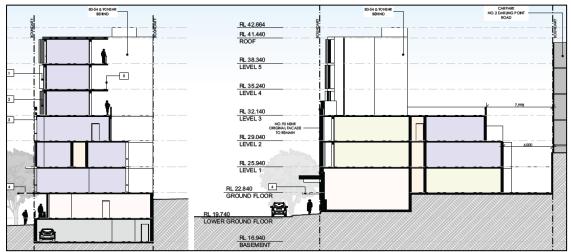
Proposed sections A (left) and B (right) with New South Head Rd on left. (Source: PTI Architecture Pty Itd)
